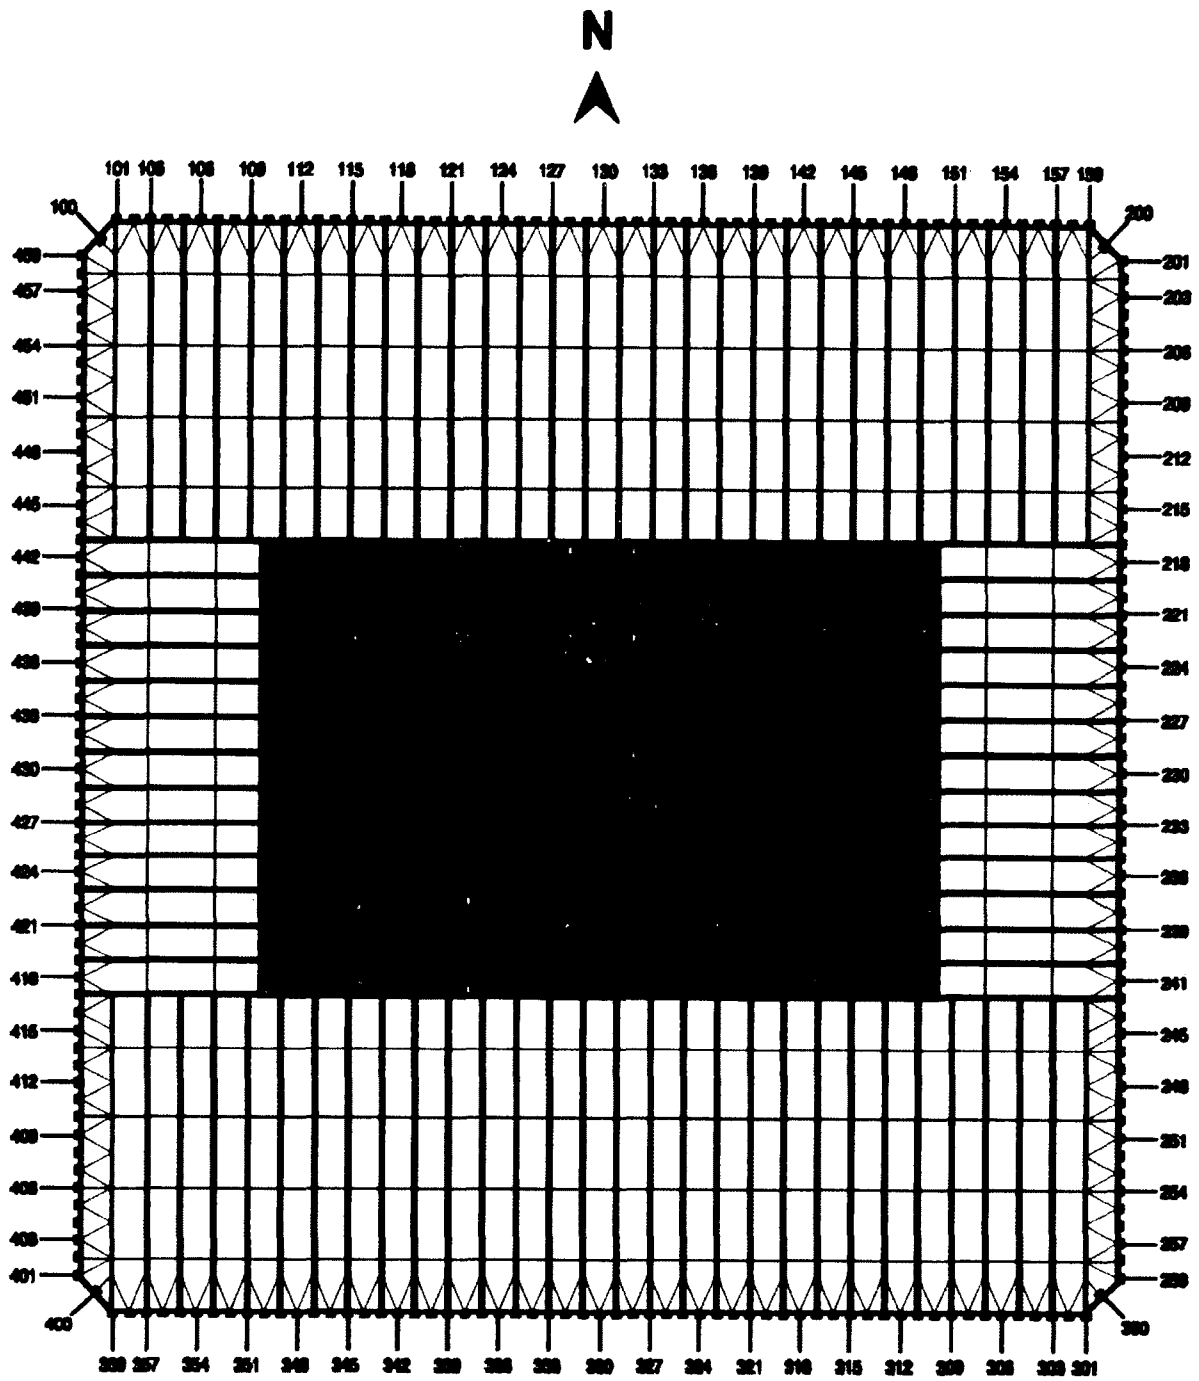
Typical floor plan of WTC Towers (Reference 23)
